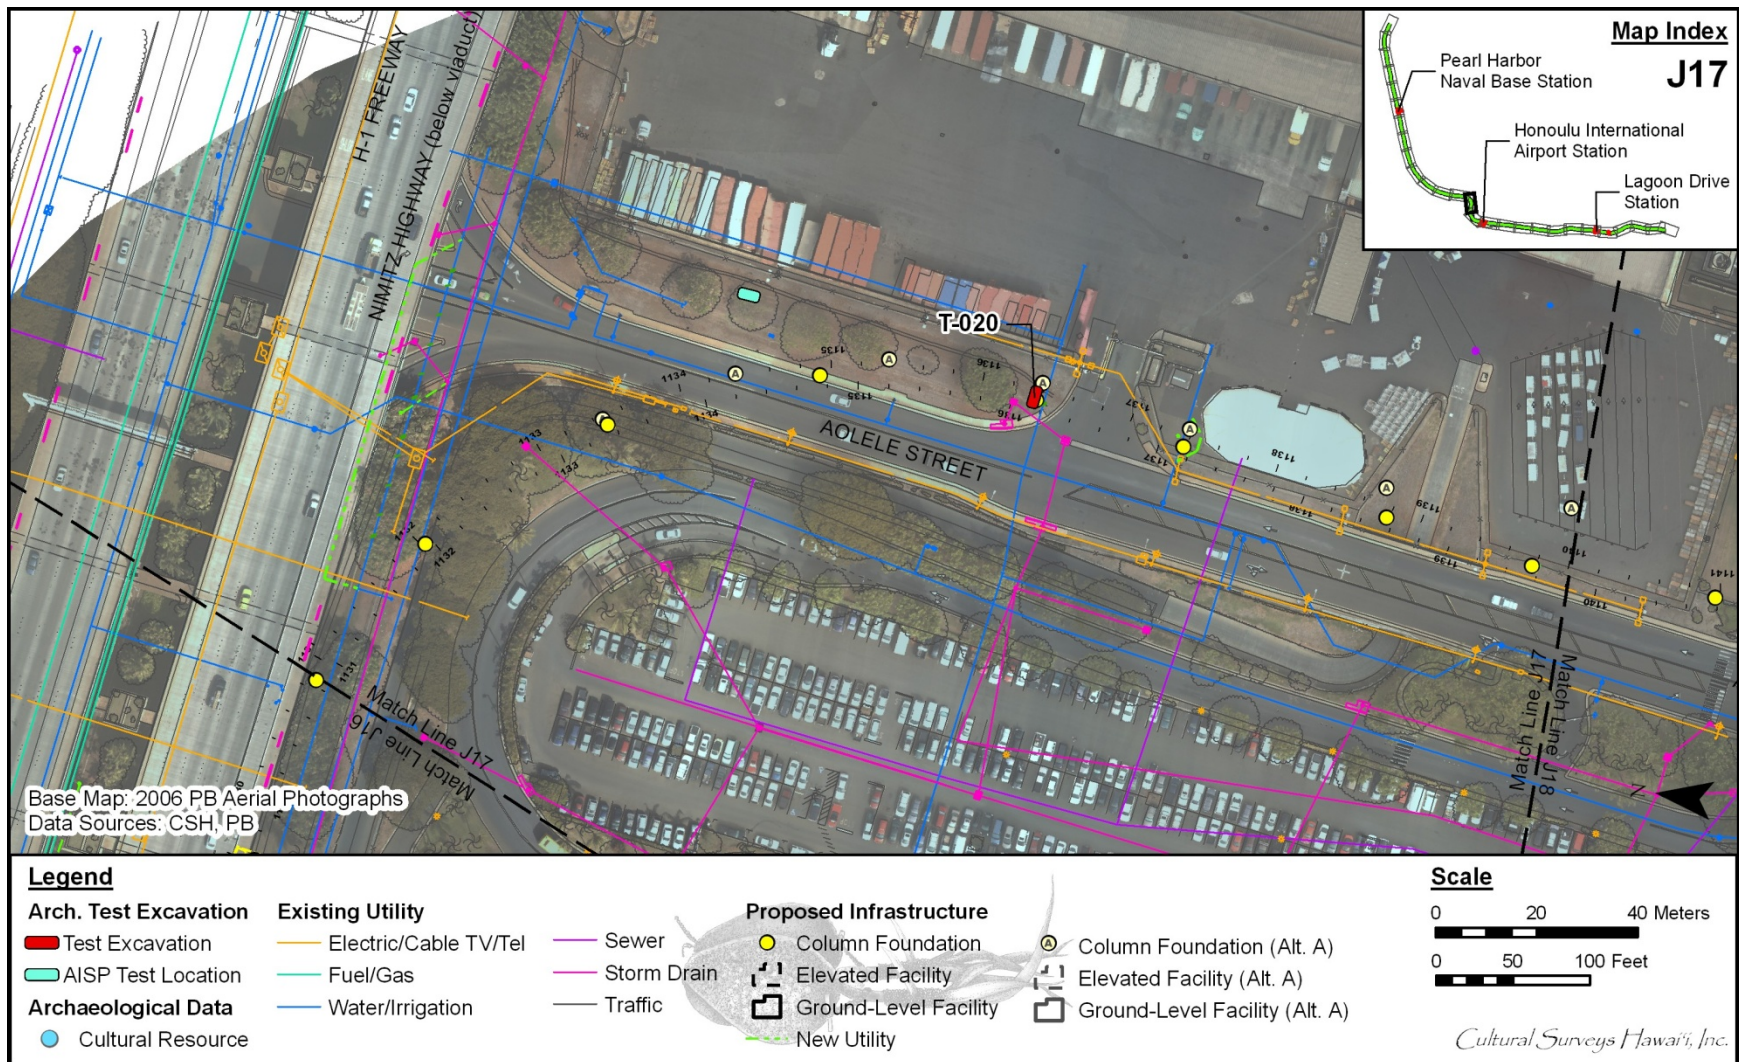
Map Sheet J17, one test excavation (T-020) at column foundation @ 1124+30
